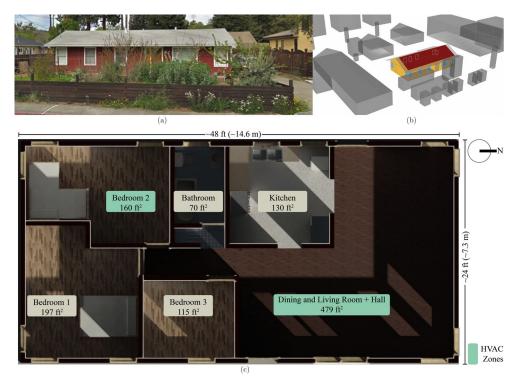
(a) East Fa, cade, (b) 3D Energy Model, and (c) Home Zones (Floor plan distribution).
